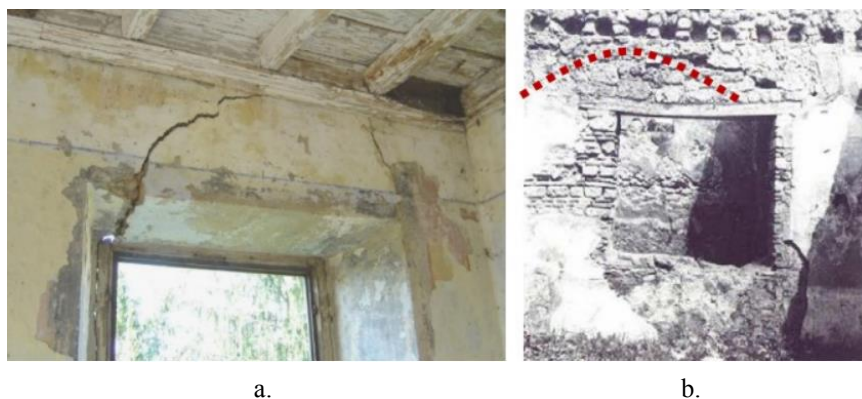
Examples of natural crack with an arc path above an opening in the wall structure.
